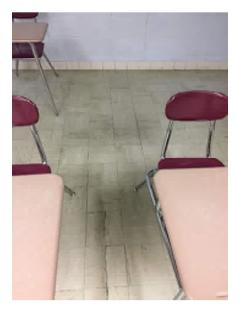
Flooring at second floor classroom along a movement joint. Remove flooring and address moment issues, replace flooring. (Priority 2)
